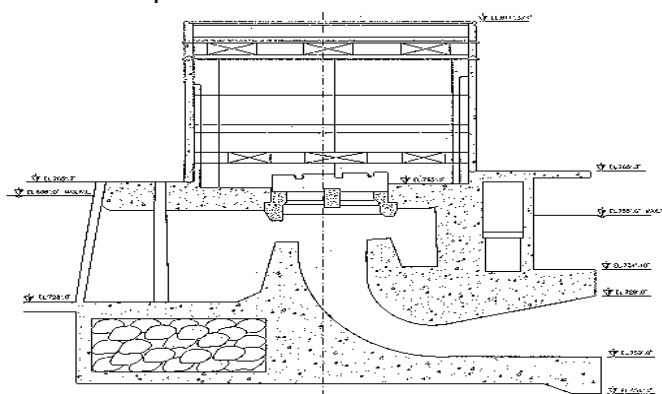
Shediwal Power Station-Powerhouse Cross Section.
